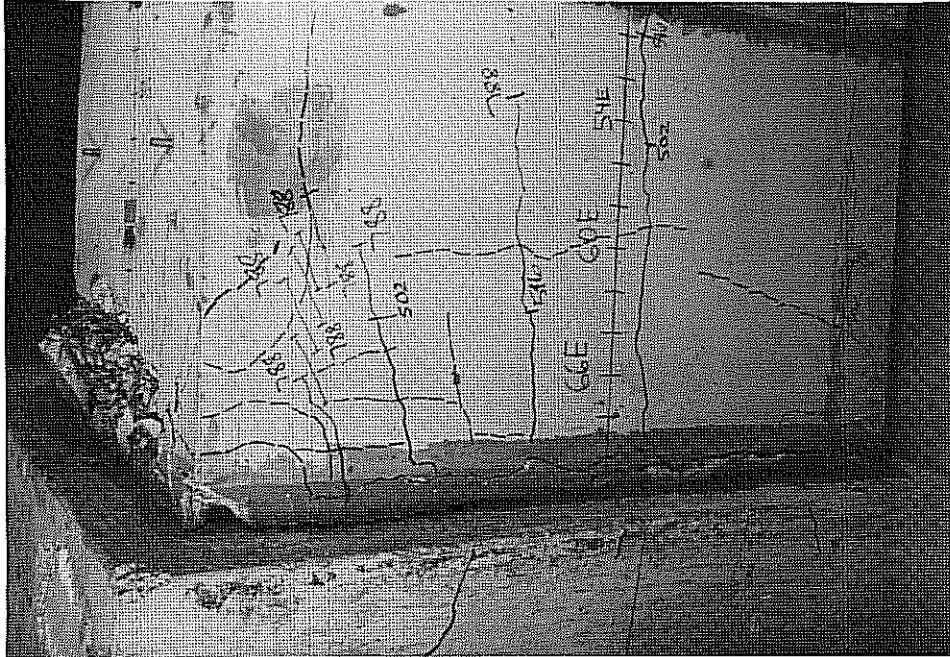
Specimen 6S16 "Tension" Flange Close-Up
